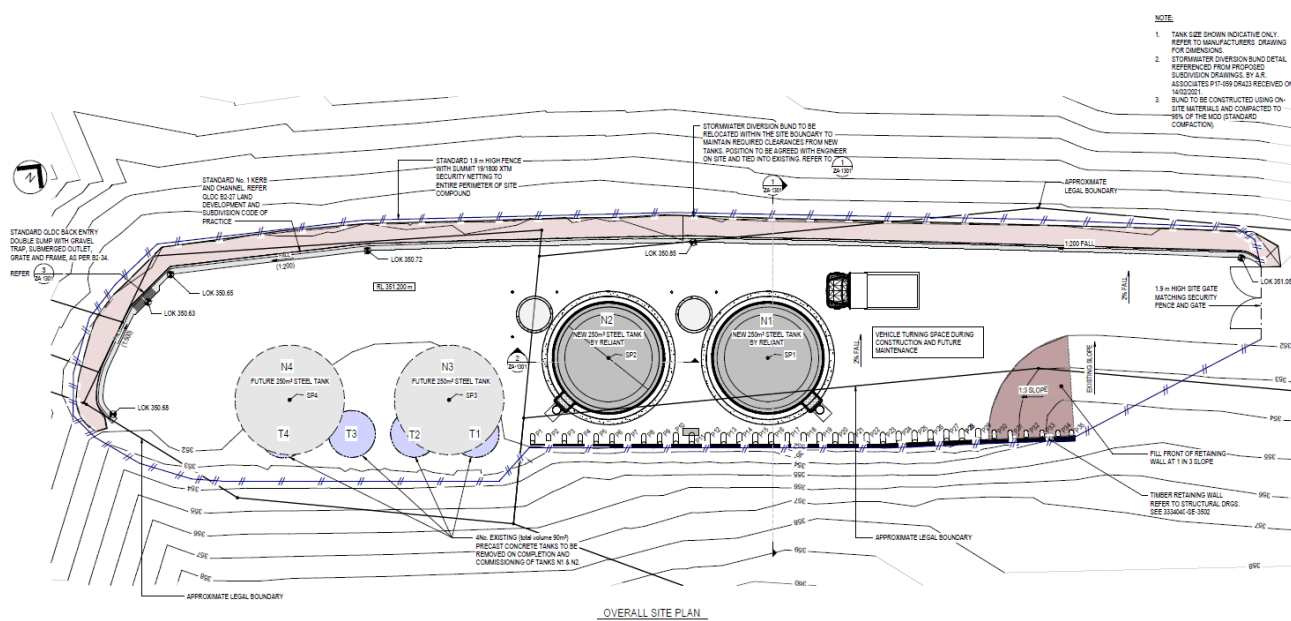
A site layout plan illustrating the location of the four existing reservoirs (T1 – T4), the two proposed reservoirs (N1 and N2) and the two future reservoirs (N3 and N4)
